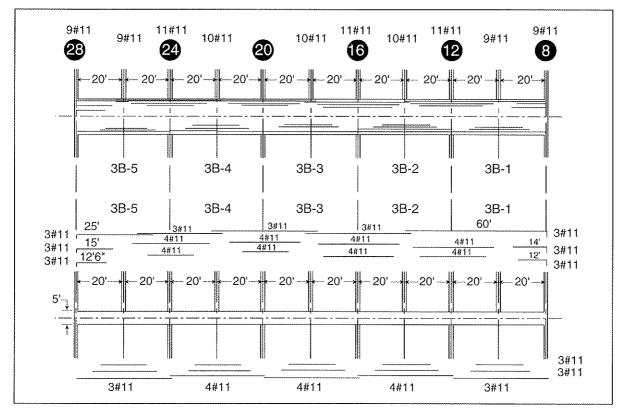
Schematic of reinforcement for transfer girder on third floor at Column Line G.
